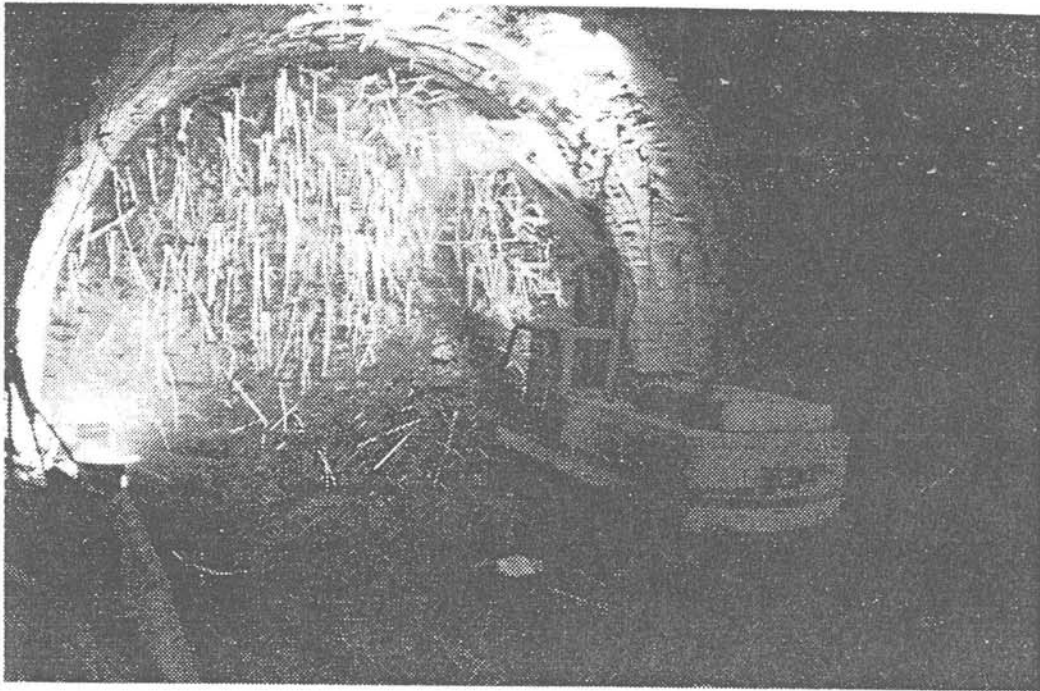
Advance ground improvement of the face with fibre-glass tubes
